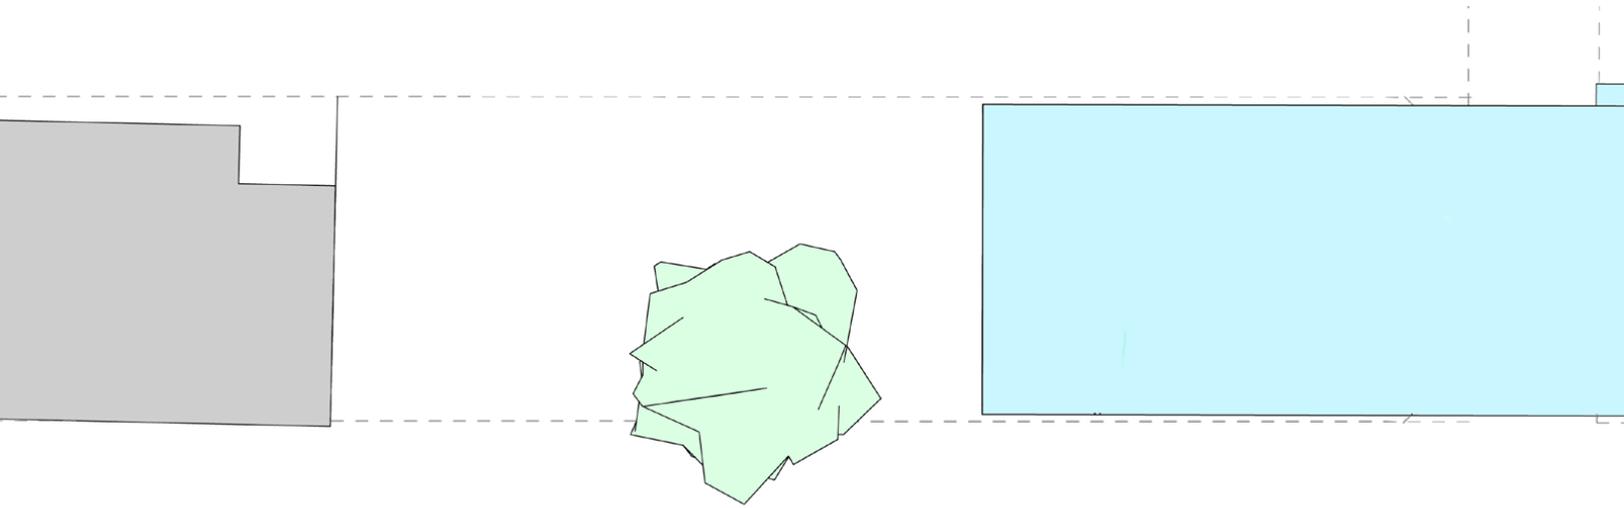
Site plan of the bridge house and the prefabricated laneway suite as a whole
